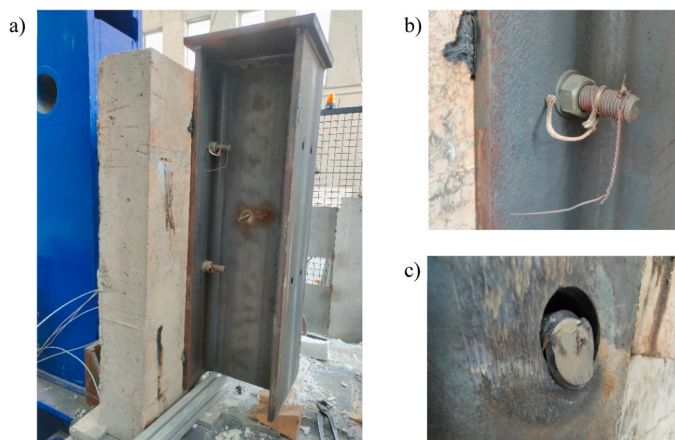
Test P3.1-T300: a) specimen after failure; b) upper row deformed bolt at the no-sheared plane; c) upper row bolt after shear failure.
